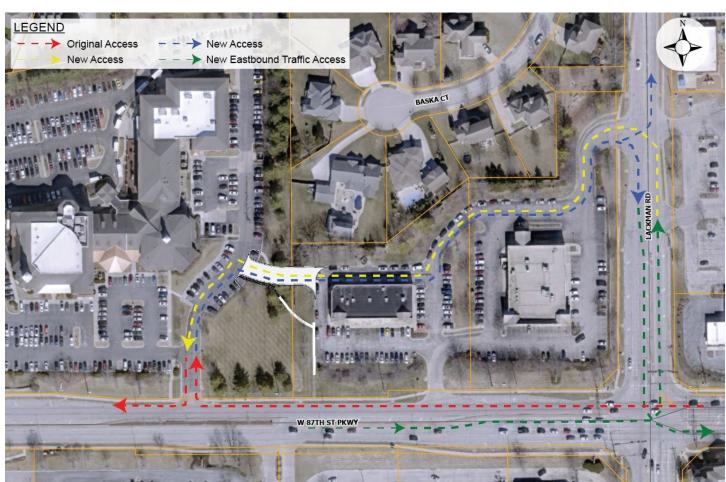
Aerial of subject site illustrating original access points (in red) to the Church from westbound 87<sup>th</sup> Street Parkway. Green lines illustrate new eastbound traffic access. Blue and yellow lines illustrate new access on Lackman to the proposed private drive.
